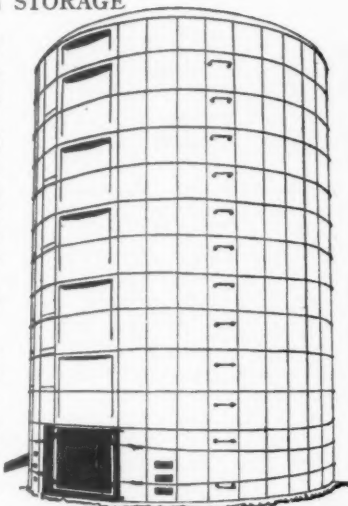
Circular bin constructed from pre-cast concrete staves. Note inverted louvres near bottom.
